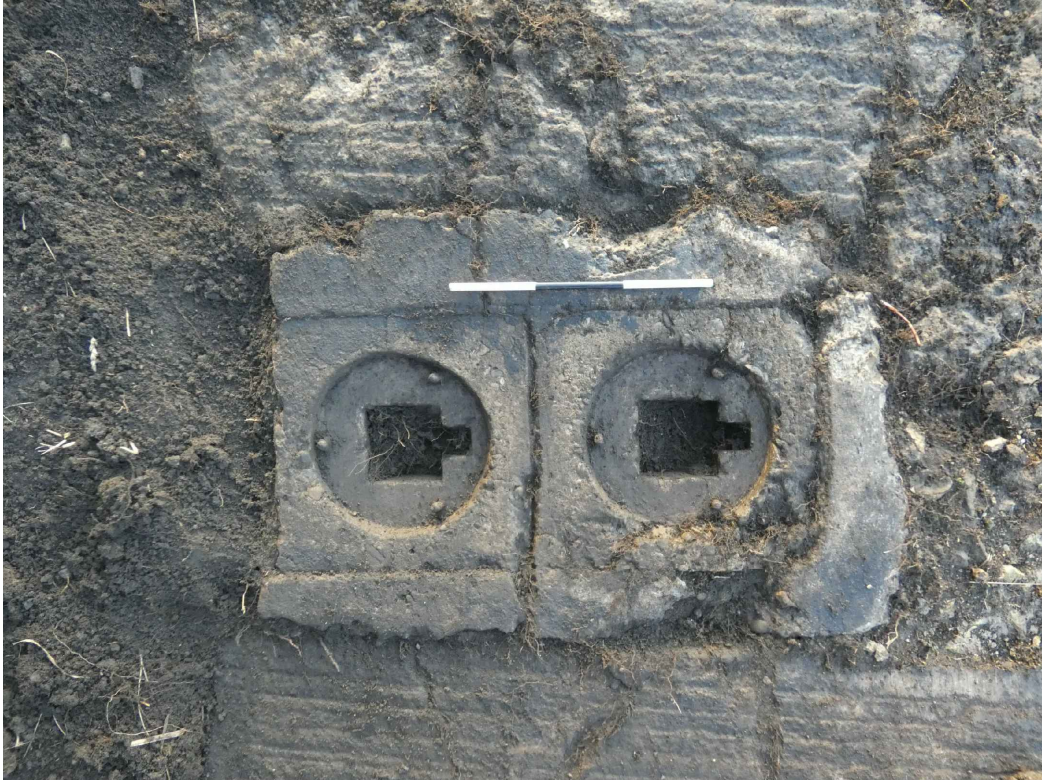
West taxi-way, excavated double light (photo 3/490).
